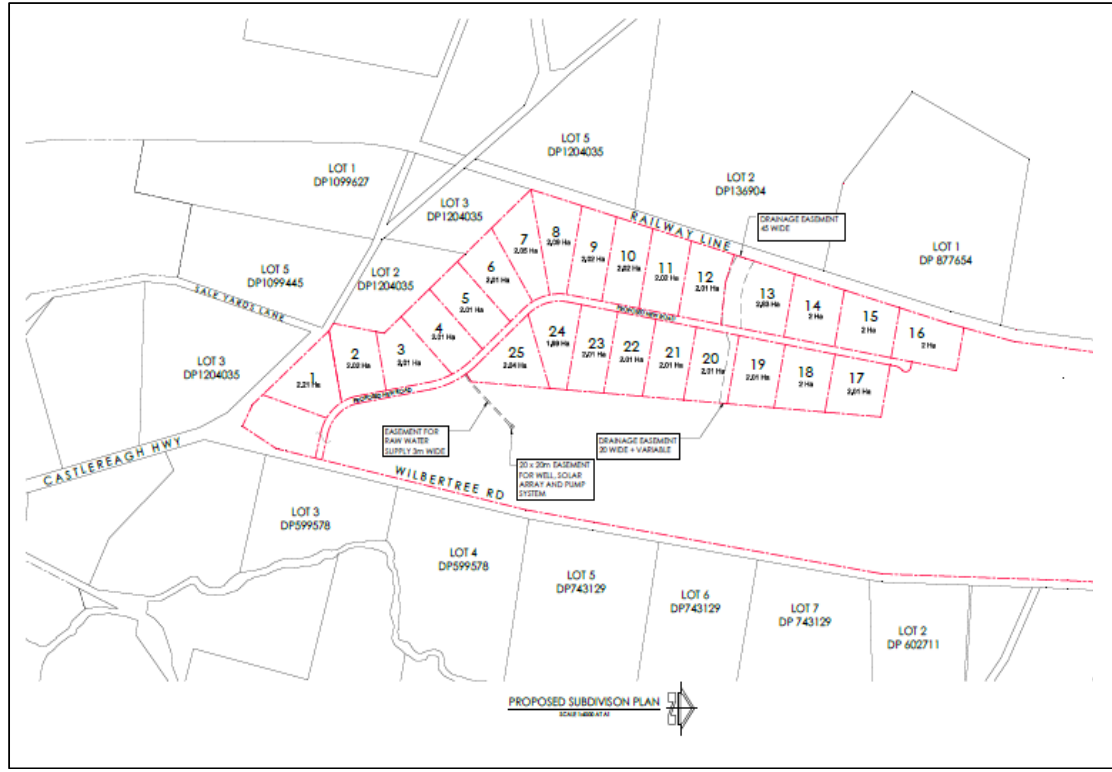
Proposed Plan of Subdivision (Stage 2 release)
